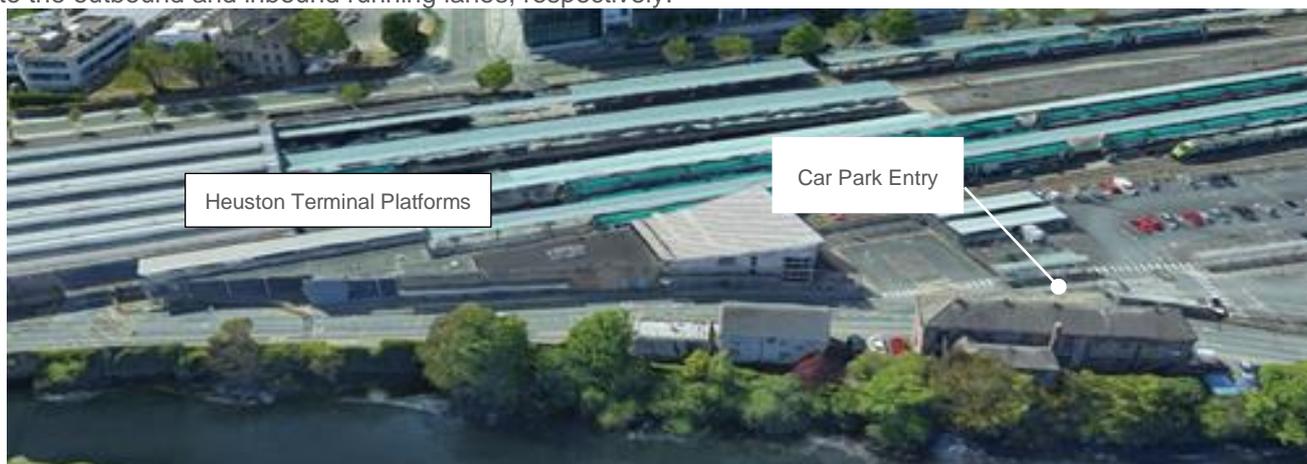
Site view. Heuston Terminal platforms and car park entry
